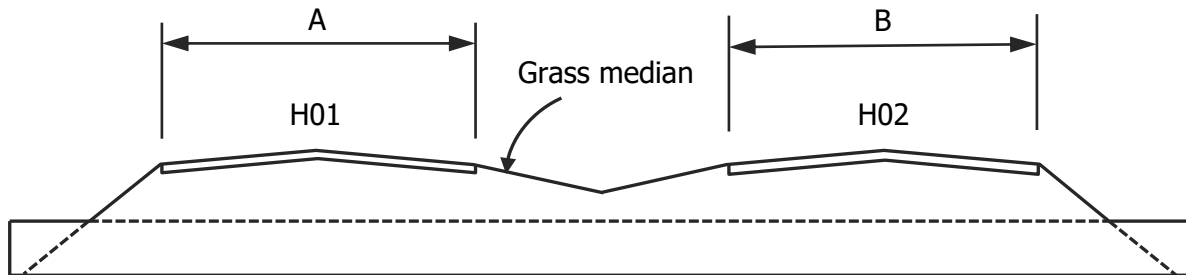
Cross-section view of two highway features carried on the pipe bridge under fill, or culvert~~under fill~~ with a grass median.
